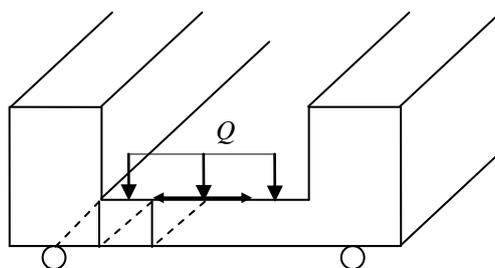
When the load is applied close to the support of the main beam no additional reinforcement is required.
